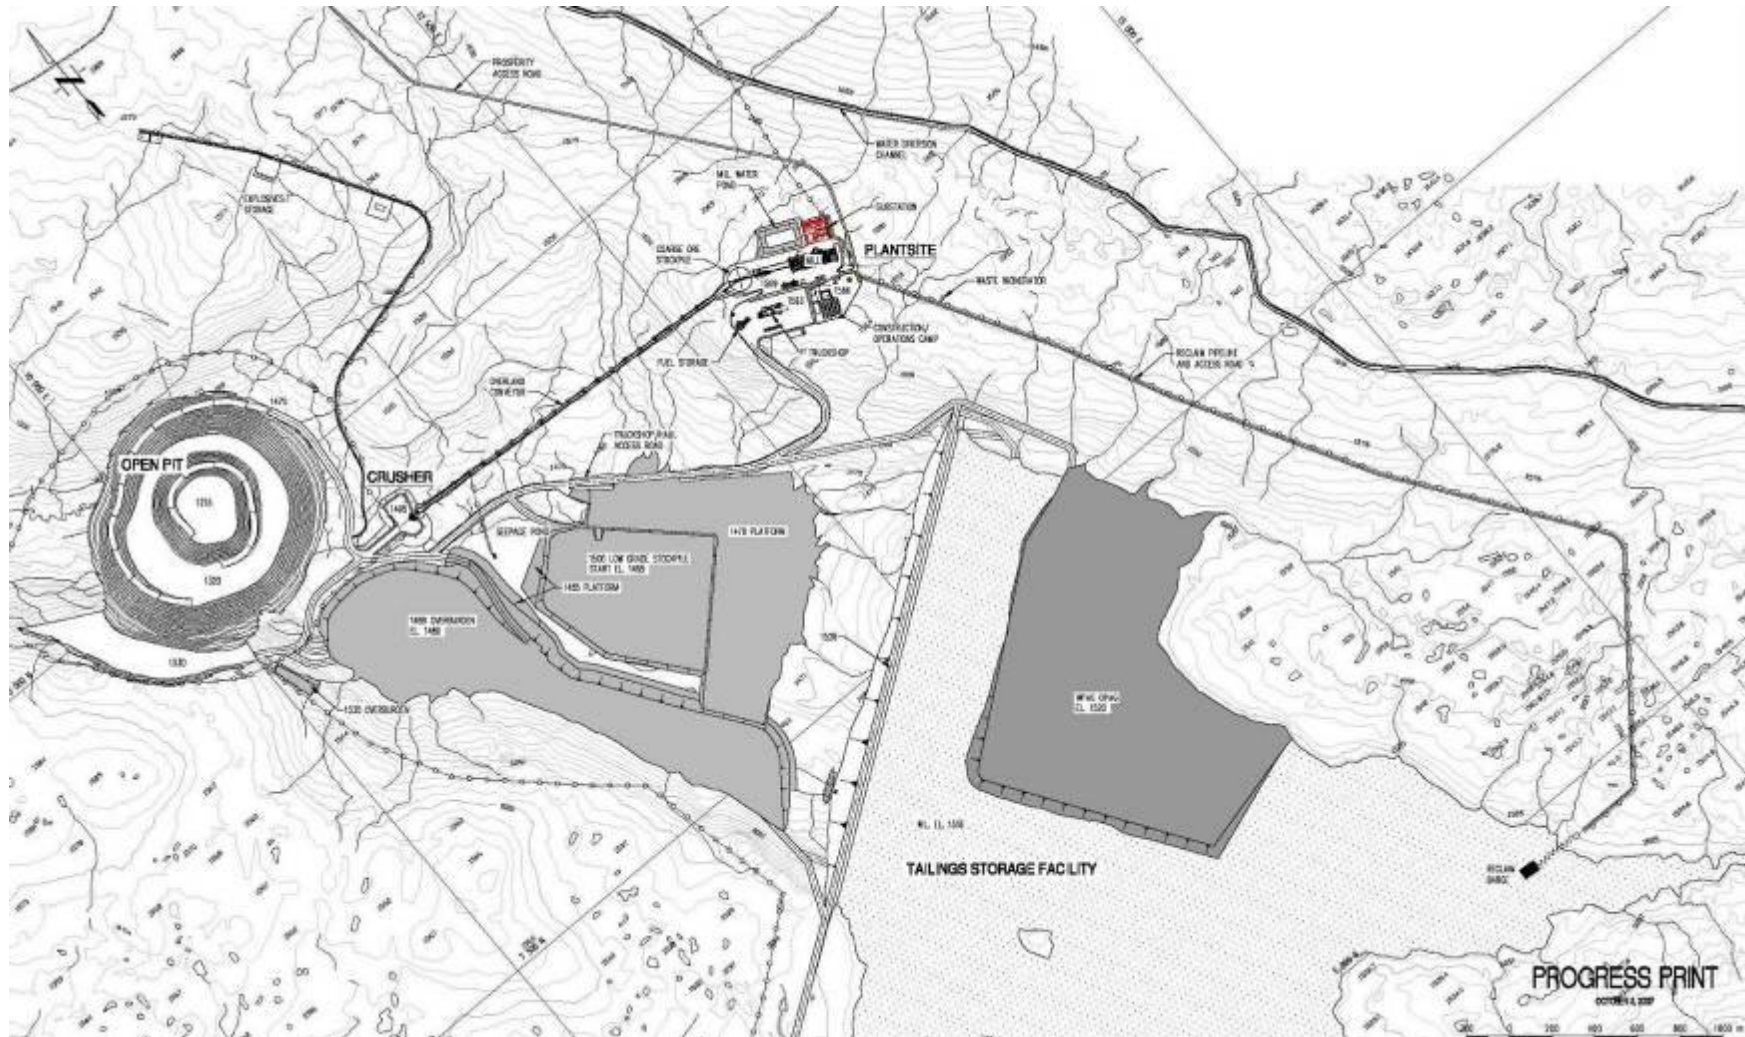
Pit and Stockpiles Plan—End of Year 5
